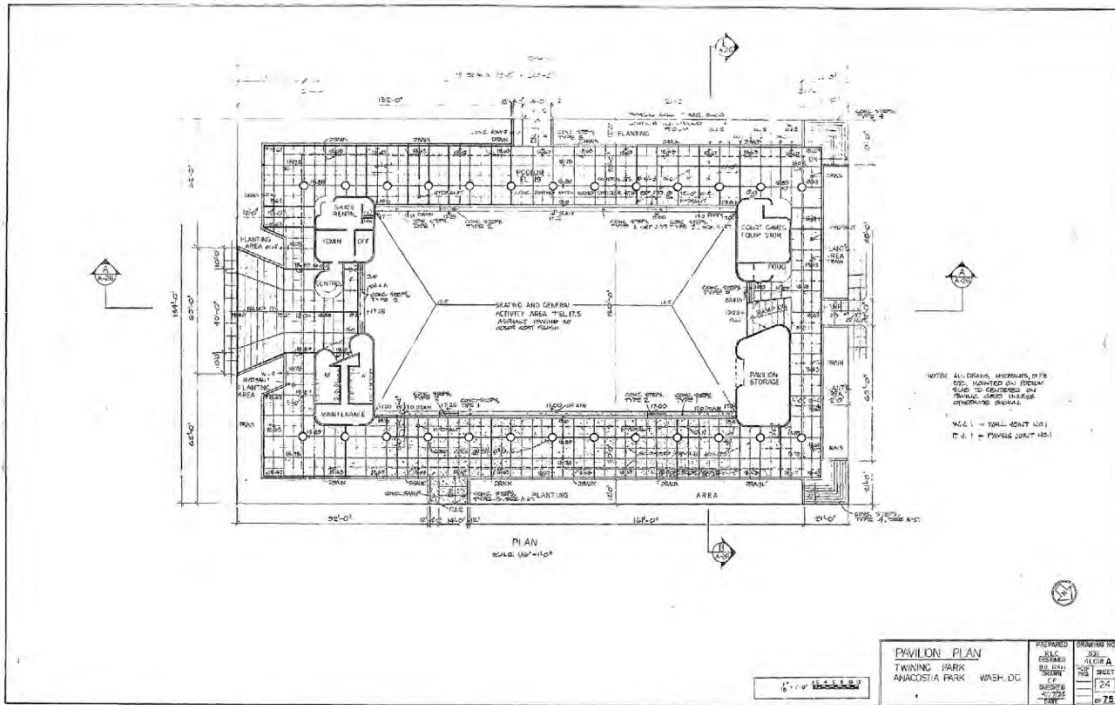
b: Section E featured an open-air skating pavilion that consisted of concrete piers and wooden trusses (Sheets 24 & 26, TIC 831_41018A)
